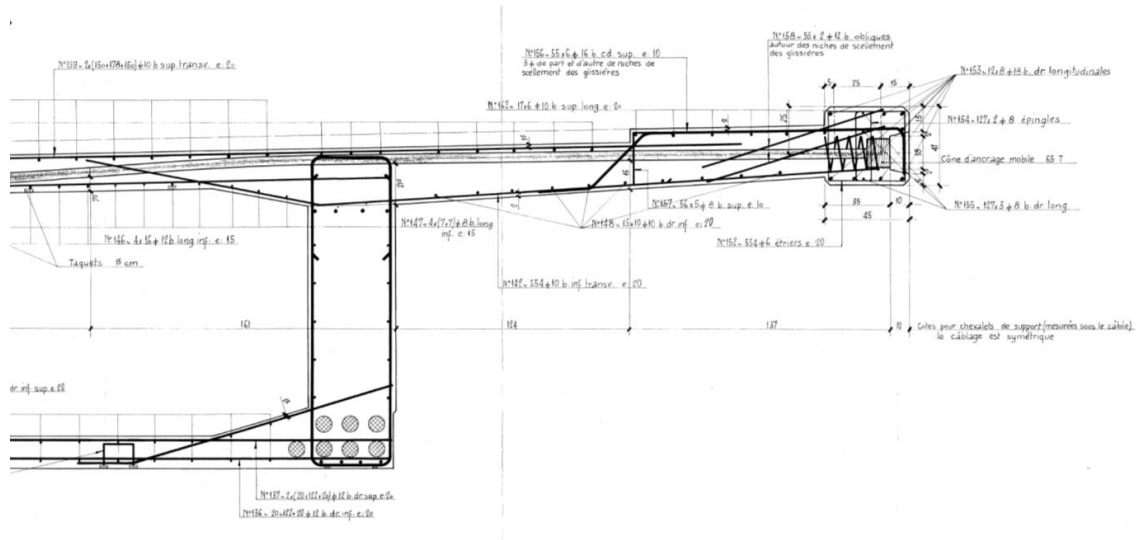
Transverse section of reinforcement at mid-span (Zoom of right hand side).
